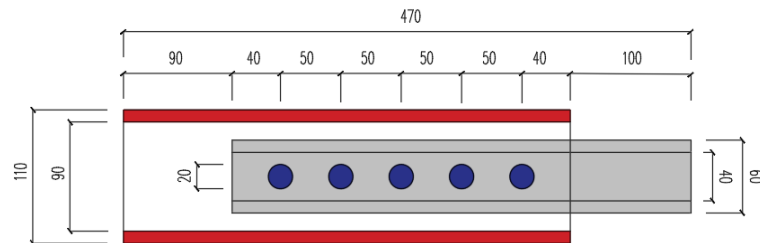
The Main Component Dimension Diagram of Mild Steel Damper
